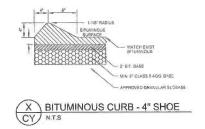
DETAILS & NOTES LARSON SYSTEMS BLDG ADDITIONS
